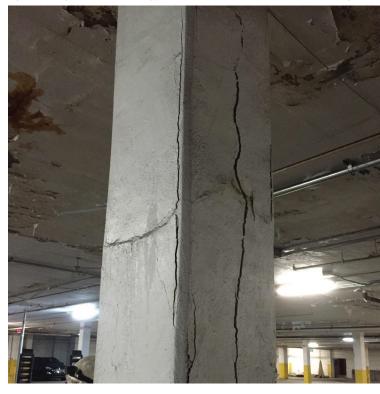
Cracking with no rust staining present; could be indicative of structural cracking
